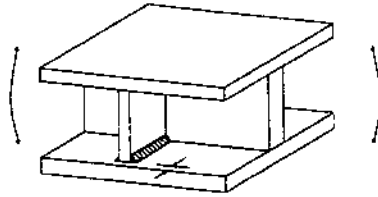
UKDEn Detail in Welded Girders 1
